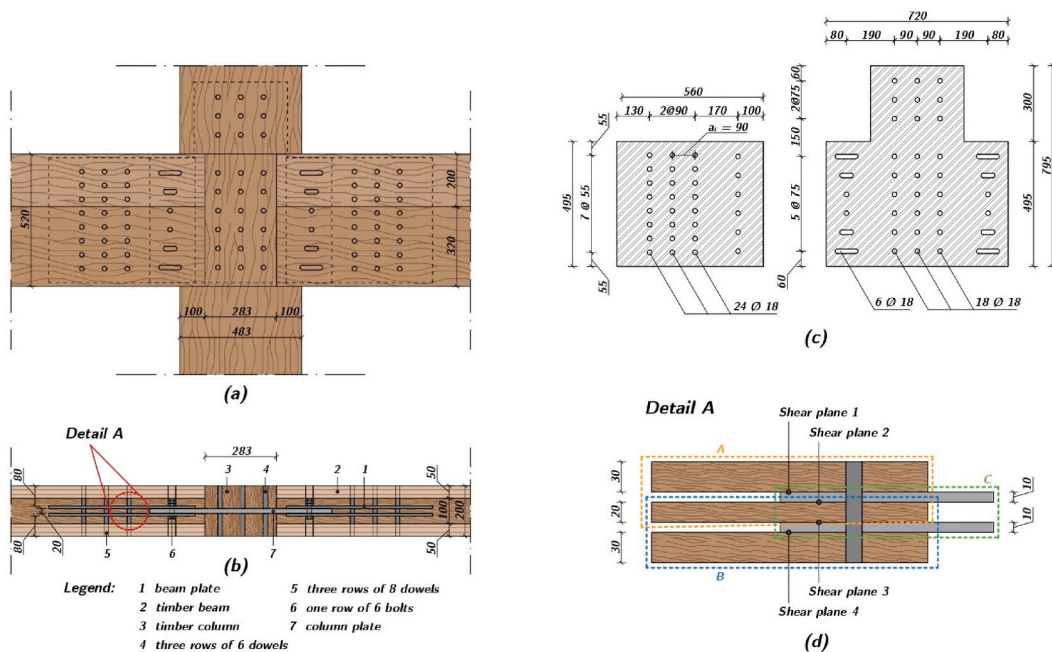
Steel-to-timber connection: (a) front view, (b) horizontal section, (c) detail of steel plates and (d) detail for calculating the load-carrying capacity of the connection involving multiple shear planes (unit: mm).
